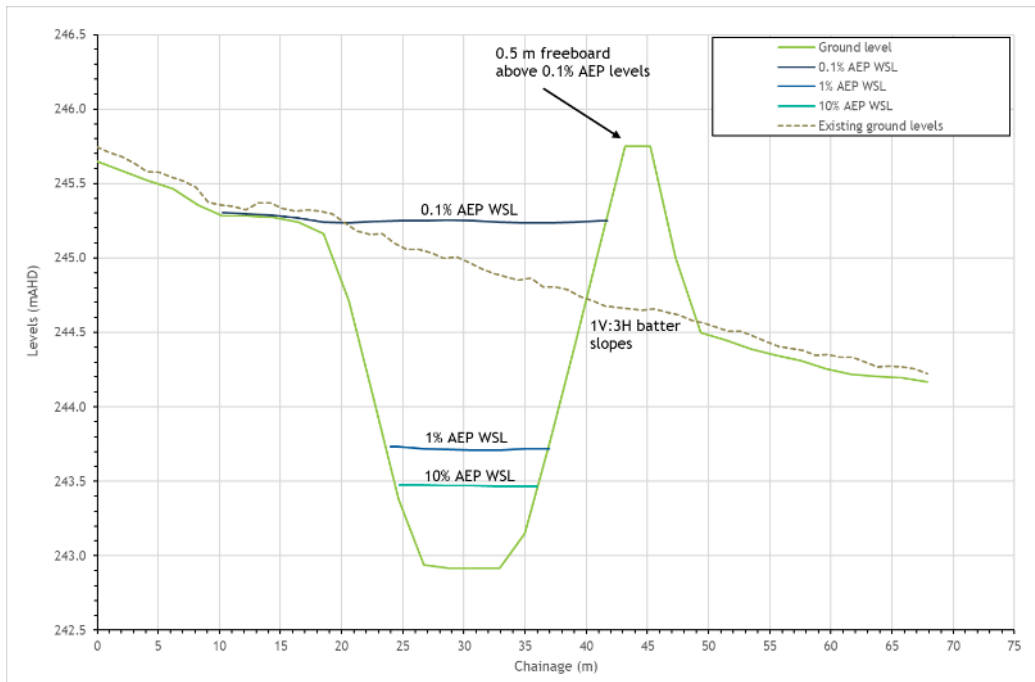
Typical cross section (XS2 in Figure 8.3) of proposed northern/eastern diversion drain around Jupiter Pit
